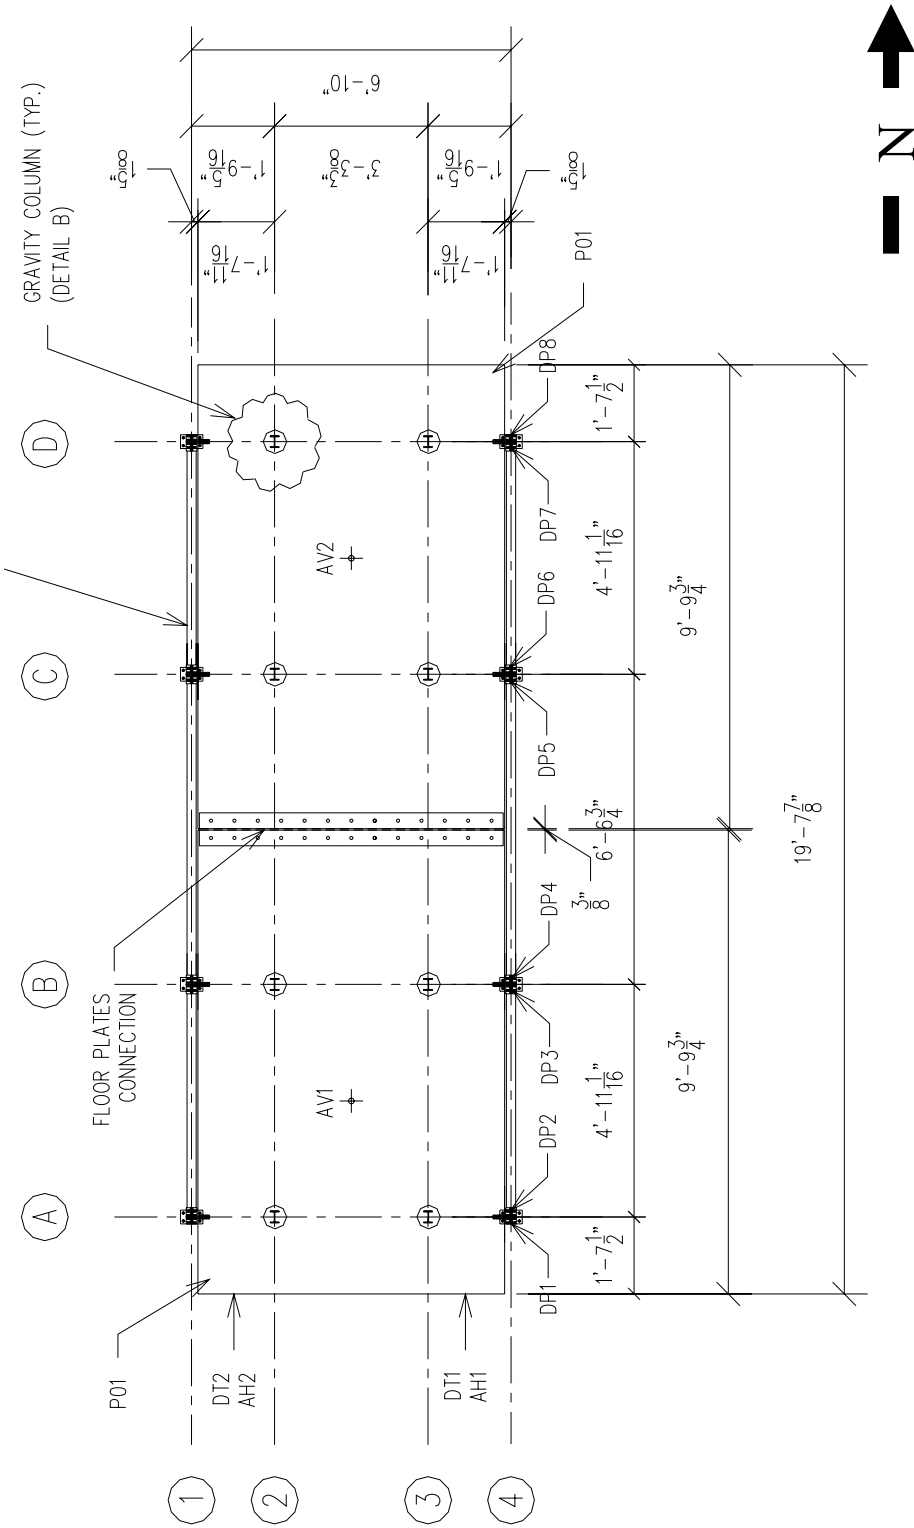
Instrument Locations for Identification Test: 1st Floor
